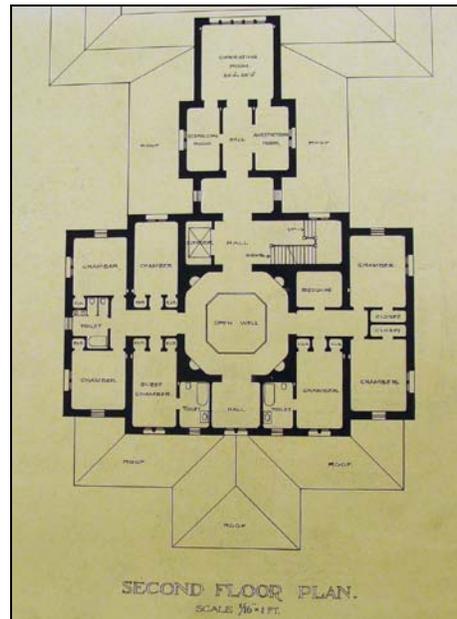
Excerpt of "Proposed Battle Mountain Sanitarium Second Floor Plan" showing Administration Building, c. 1902
